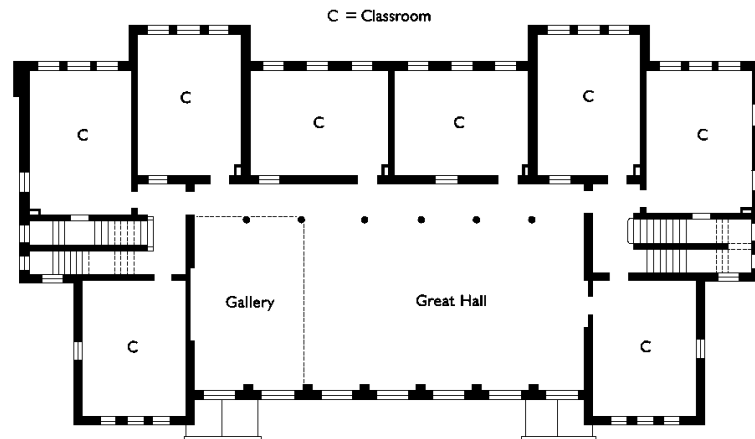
the T Roger Smith's plan adopted for Jonson Street School, Stepney, by the London Board, which was the first to experiment with separate classrooms with a central schoolroom
